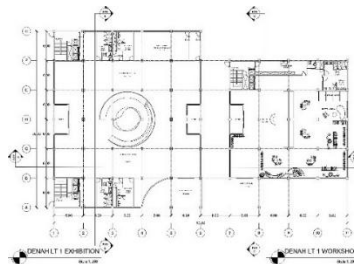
1<sup>st</sup> Floor plan Production Building
